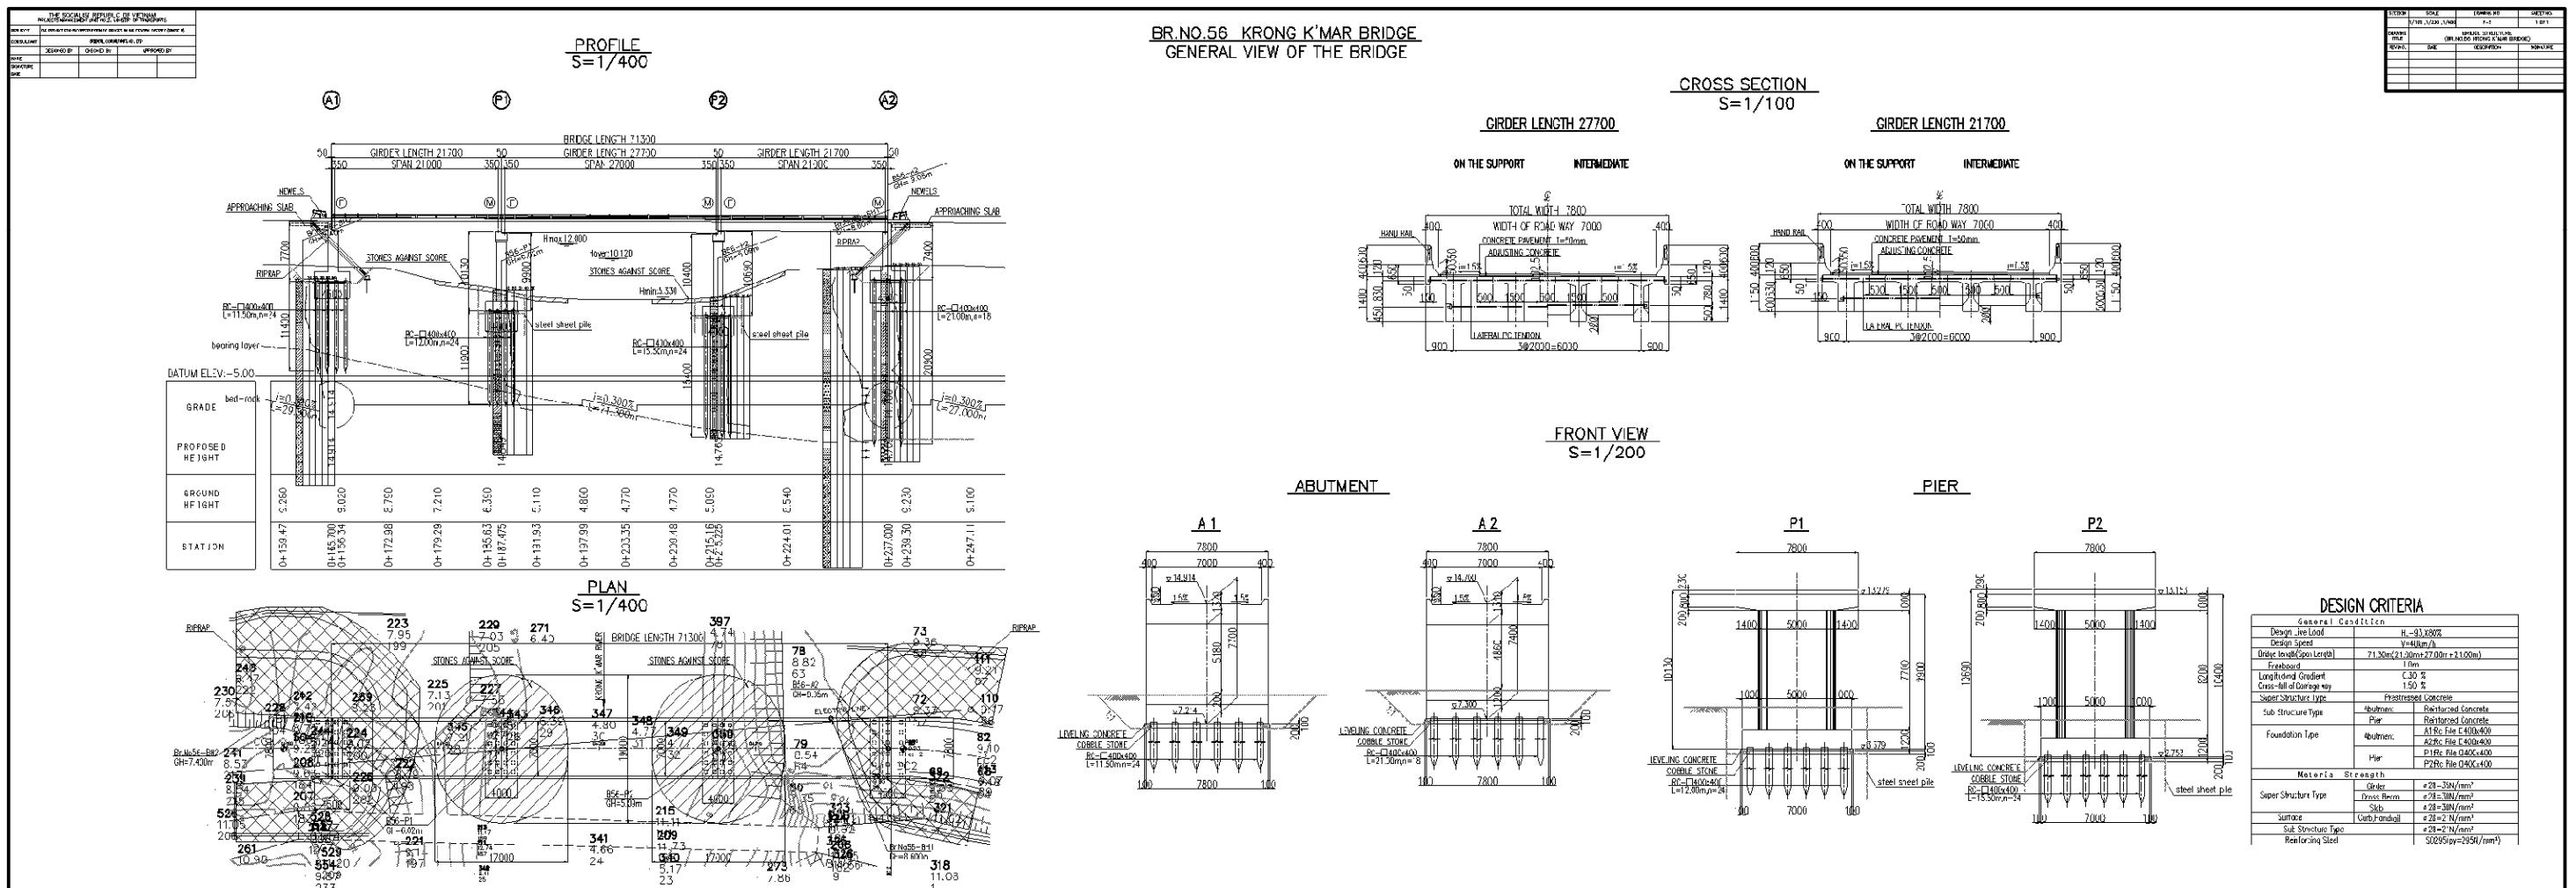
Krong K'mar Bridge (General View for Structure)
